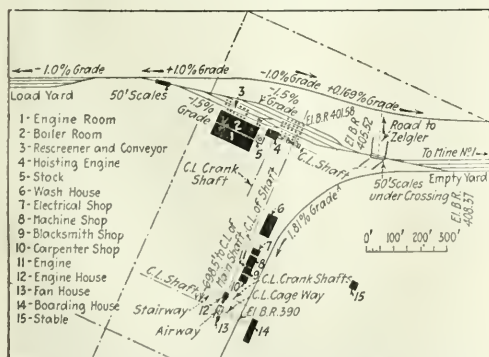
SURFACE LAYOUT, BELL & ZOLLER NO. 2 MINE
